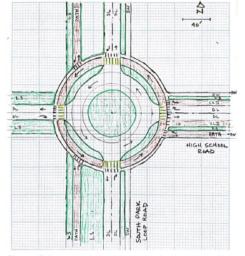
Conceptual roundabout plan for the intersection of High School Rd. and South Park Loop Rd.
